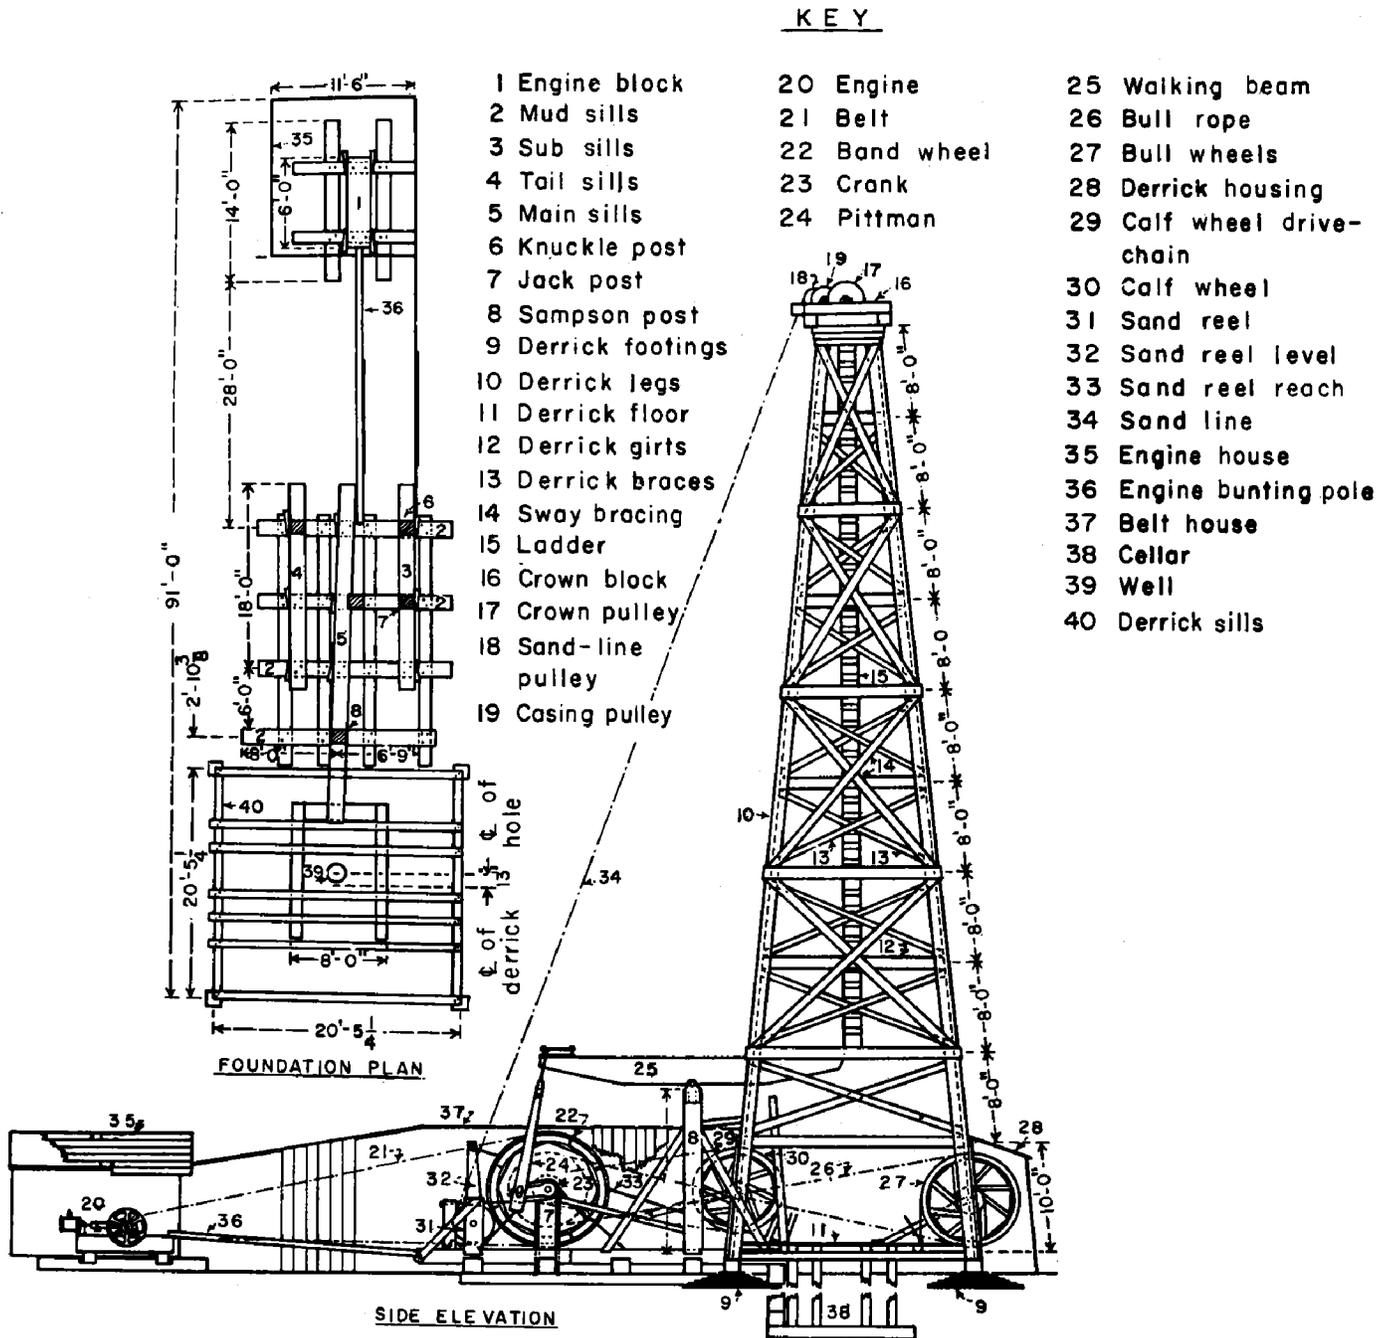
Plan and Elevation of an 82-Foot Standard Cable-Tool Rig and Wooden Derrick.
